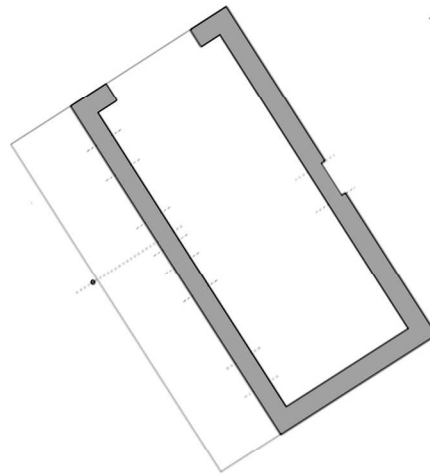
Plan of Second House on Present Poort on a scale of 1:200
